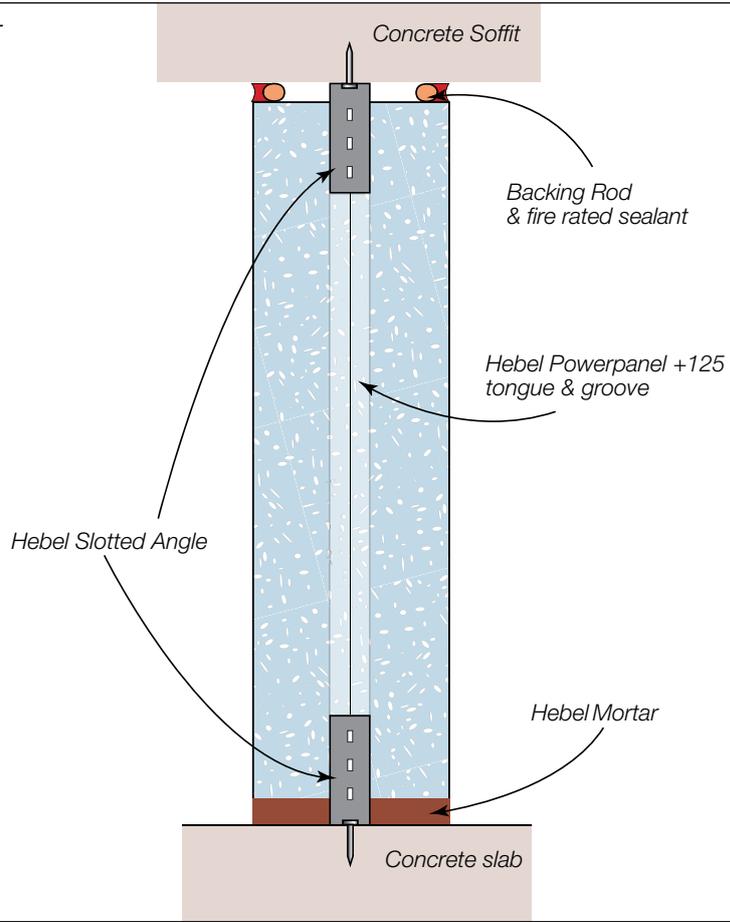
Plenum Wall Option 2 - Vertical Cross section detail
